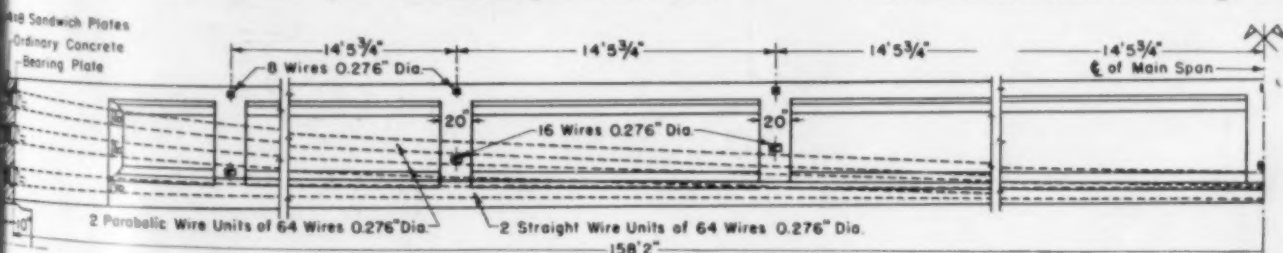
PRESTRESSING WIRE units inside their metal sheaths are concreted in as girder is poured. Before scaffolding and forms are removed, wires passing through sandwich plates are prestressed to 125,000 psi, wedges are driven and grouted in.
